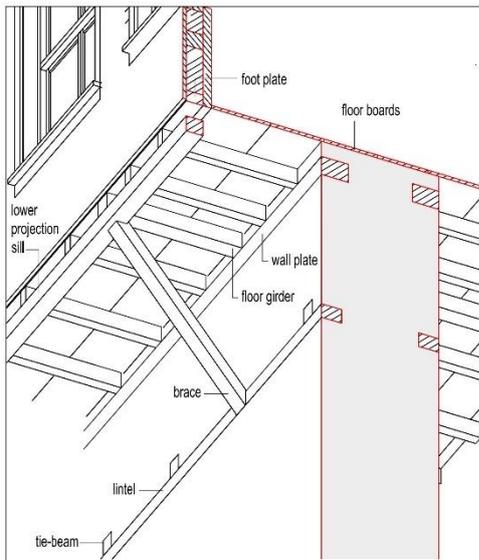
Main timber girders sitting on timber lintels on stone masonry wall (2819-1-9)
